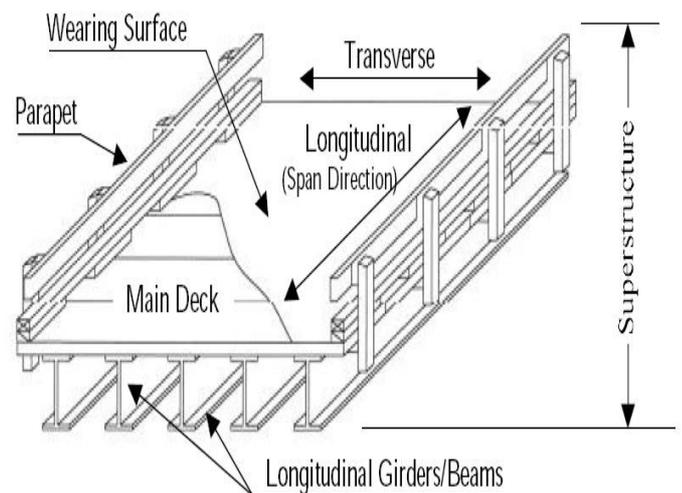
Superstructure of a bridge illustrating bridge engineering terms
